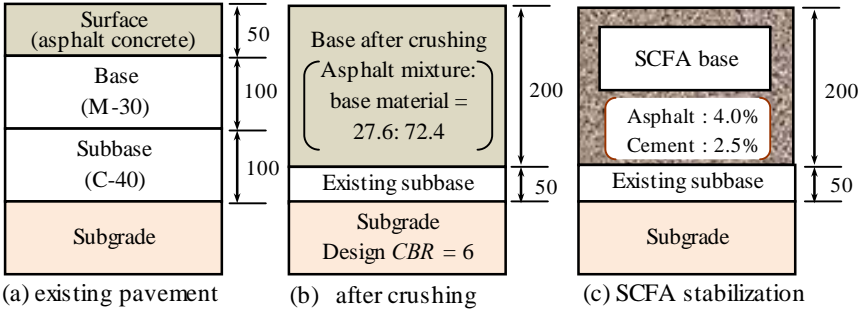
Cross section of the pavement at the accelerated loading test yard (unit: mm).
